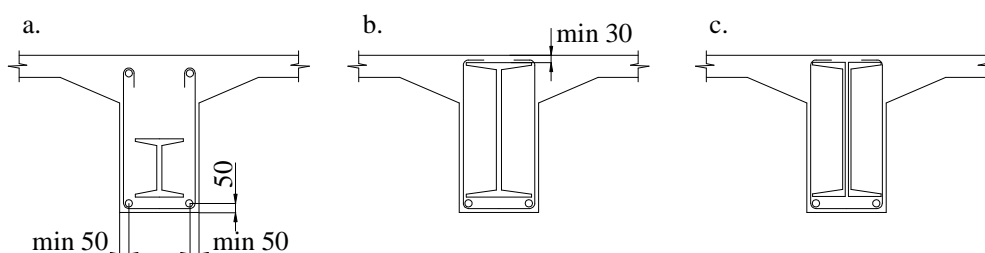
The cross sections of bent elements with the use of rigid reinforcement
